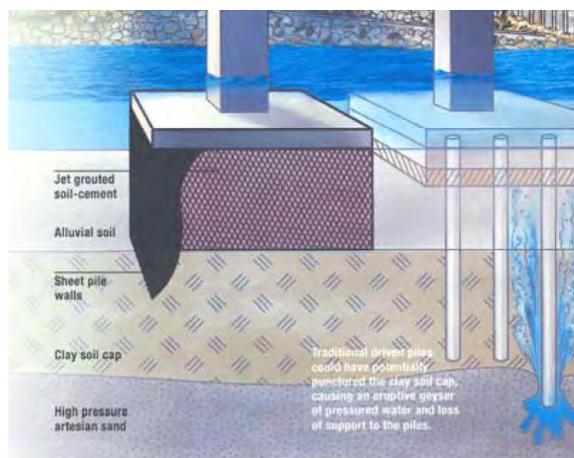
The applied soil improvement under the foundations of the bridge over the Huron River and an exemplary illustration of the failure resulting from the hydraulic puncture of artesian waters (Byrum 2008).
